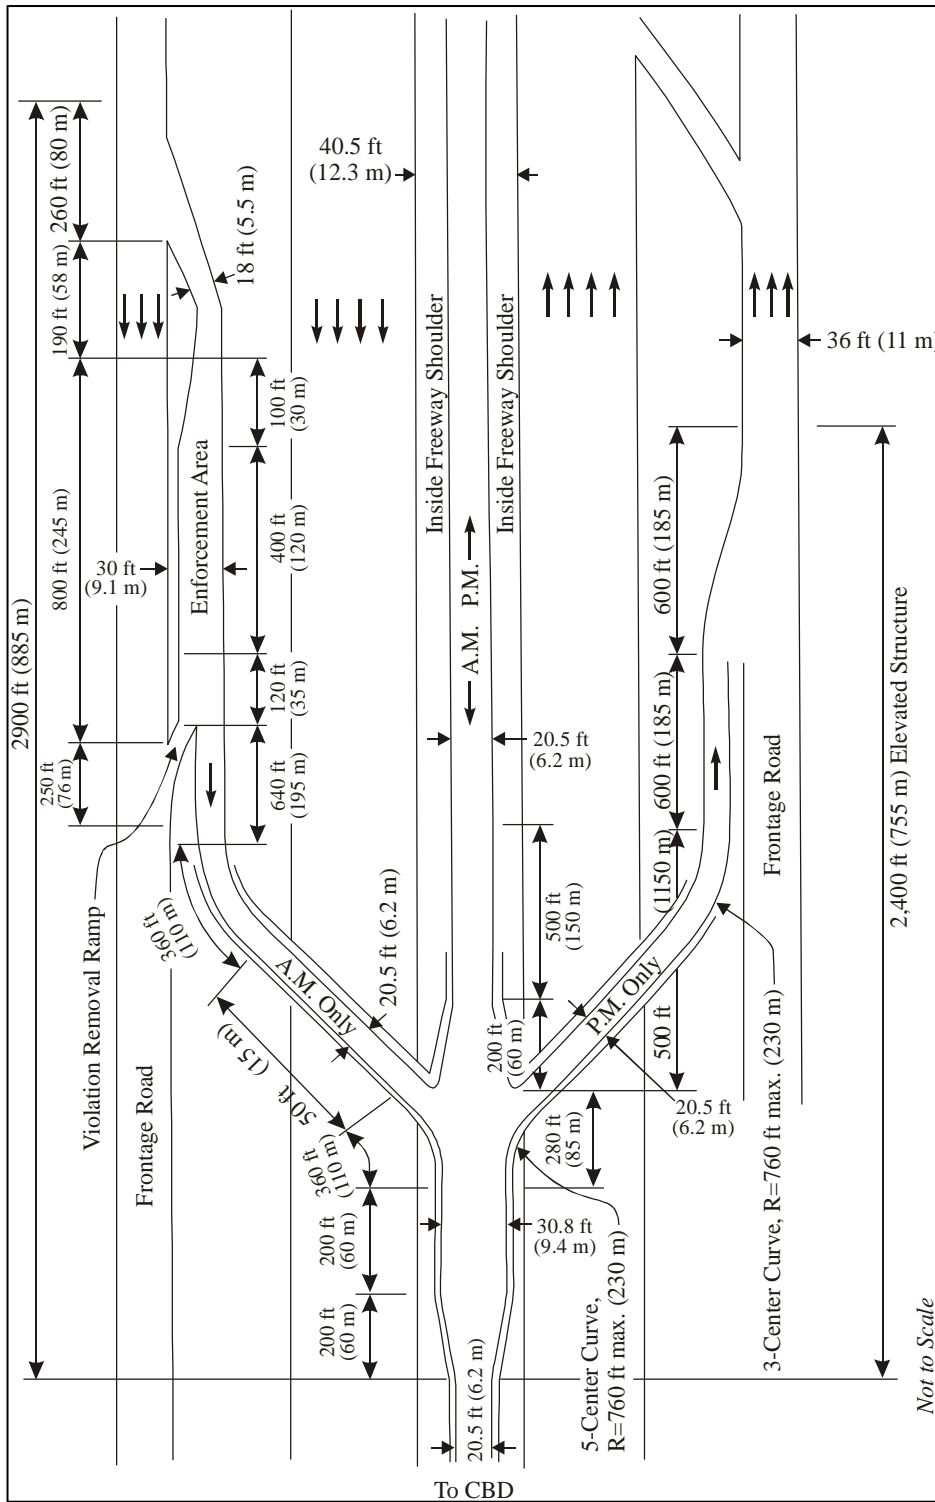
Flyover Ramp Used at FM 1960 along I-45 (North Freeway) in Houston, Texas (Adapted from Reference 14).
